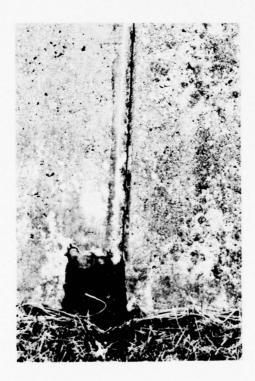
River Wall - Leaking vertical monolith joint at base of monolith
